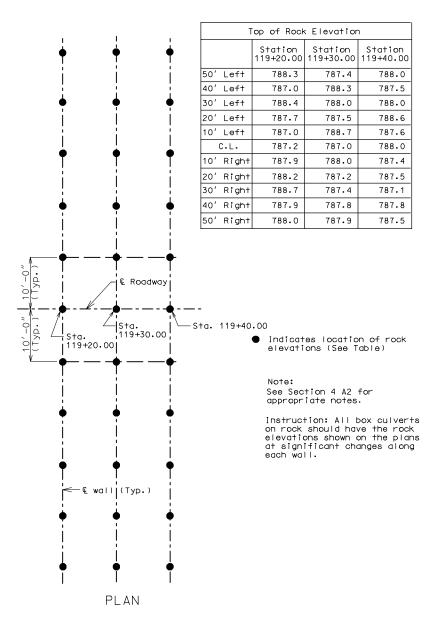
Details of Plan Showing Rock Elevations for Alternate #1
